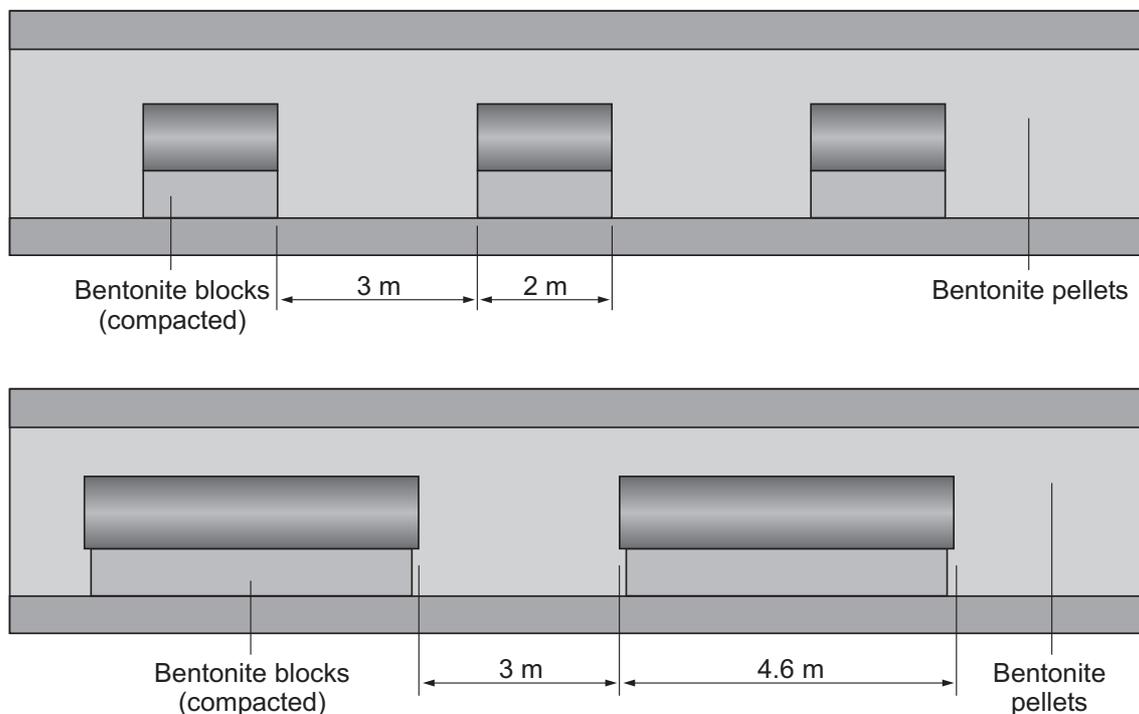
Longitudinal section through disposal tunnels for canisters of HLW (top) and SF (bottom) at completion of canister and backfill emplacement
